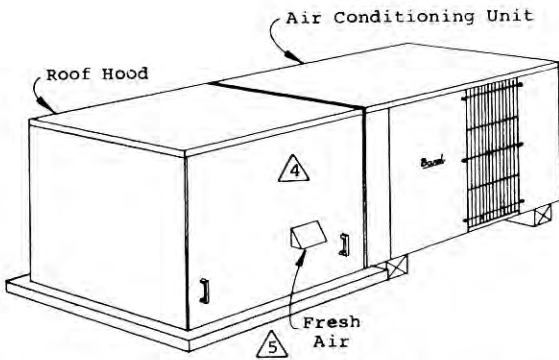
TYPICAL ROOFTOP INSTALLATION
